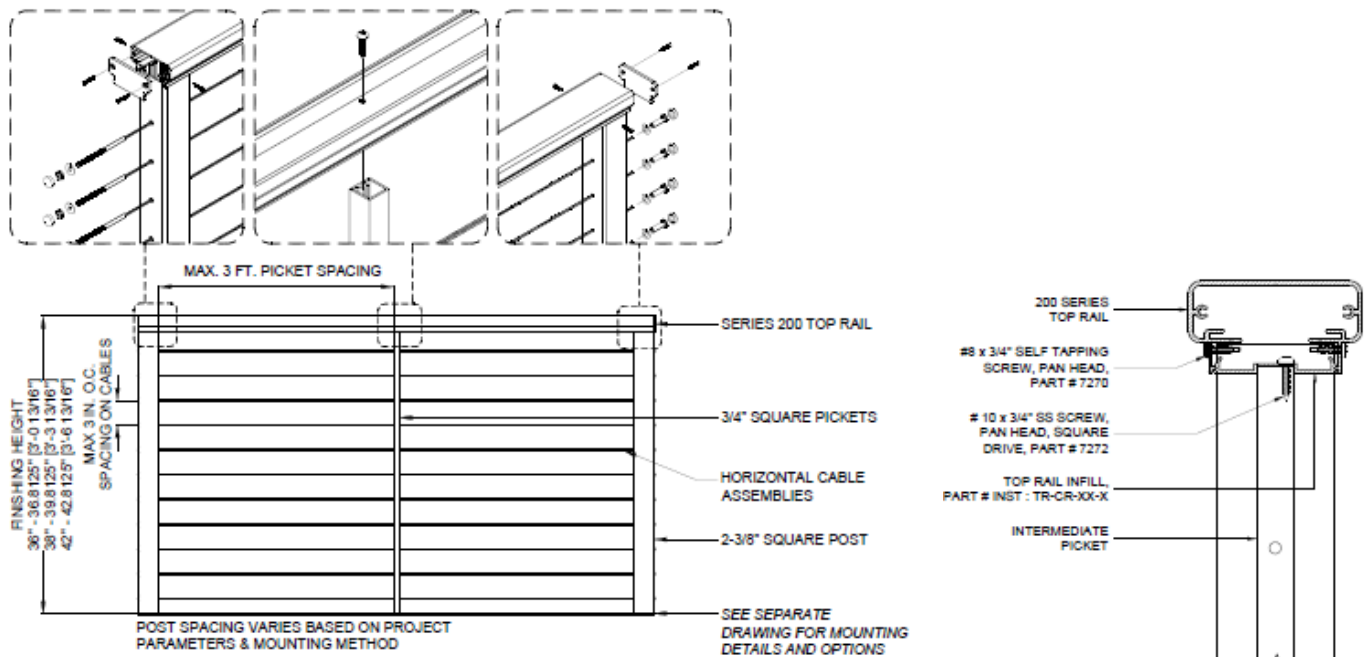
Series 200, 300, 350 and 450 Horizontal Cable Rail Assembly (Series 200 shown without bottom rail)
